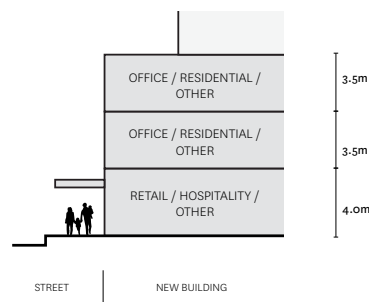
Diagram showing the minimum floor to floor heights for the street wall / podium levels of buildings.
